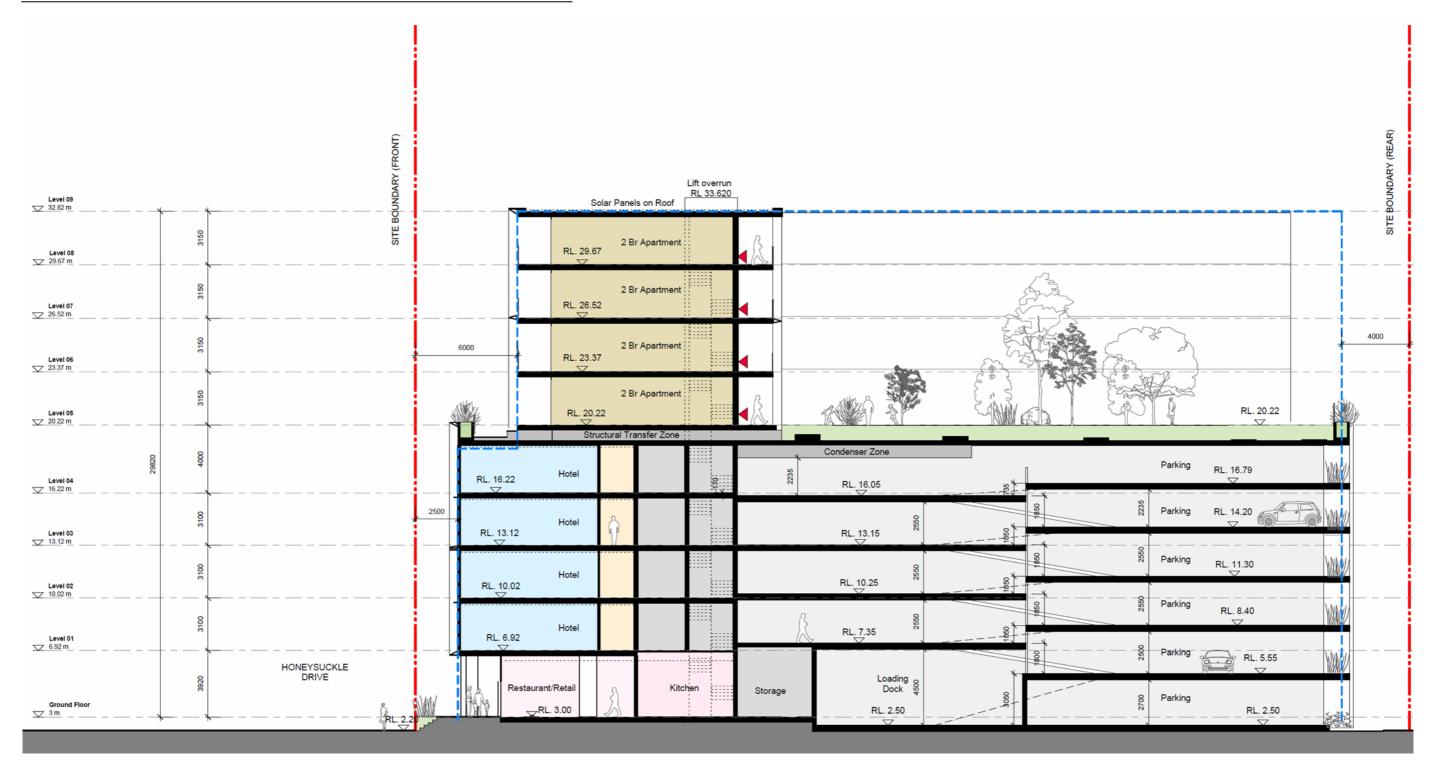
Excerpt of Current North-South Section plan for the development. Bates Smart Section North-South Plan No. A11.002 (September 2017).
